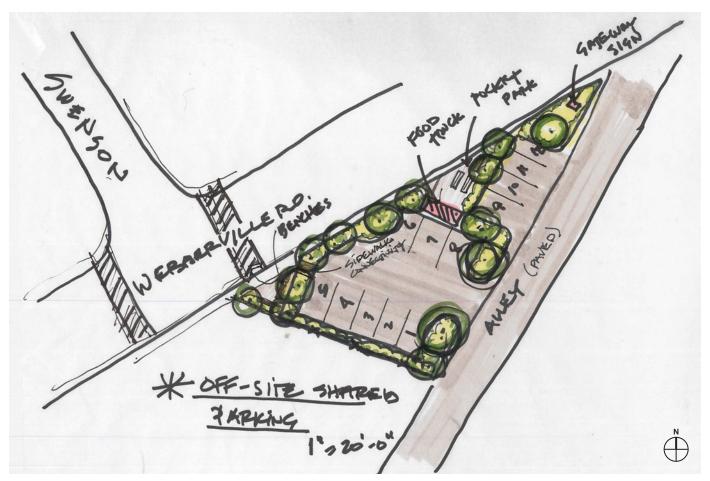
Webberville Road & Swenson Street Redevelopment
